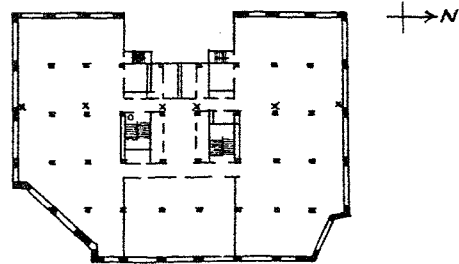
Plan of a building of 12 stories above and 3 stories under ground.
